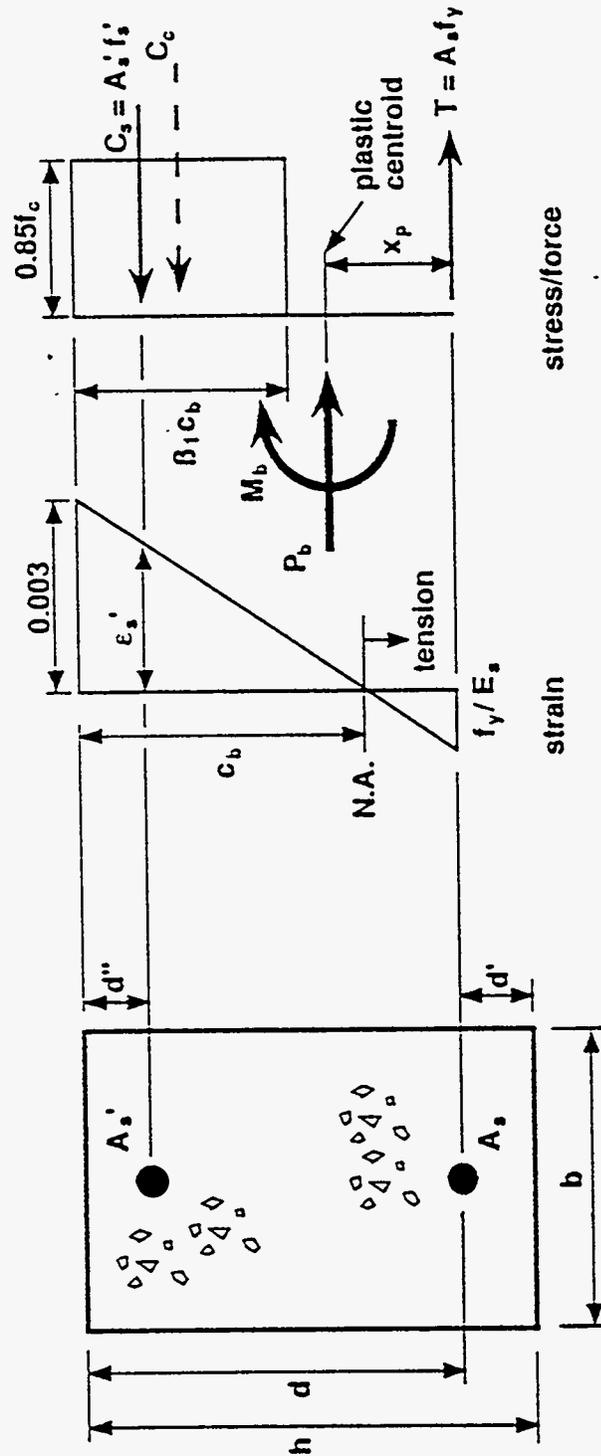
Capacity Sections for American Concrete Institute
